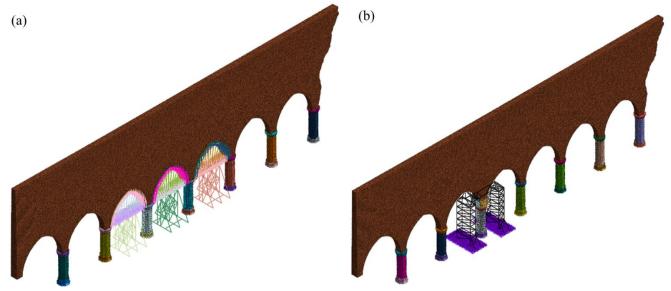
FE models of the unloading-reloading systems (a) steel-ribs system (b) clamping system.
